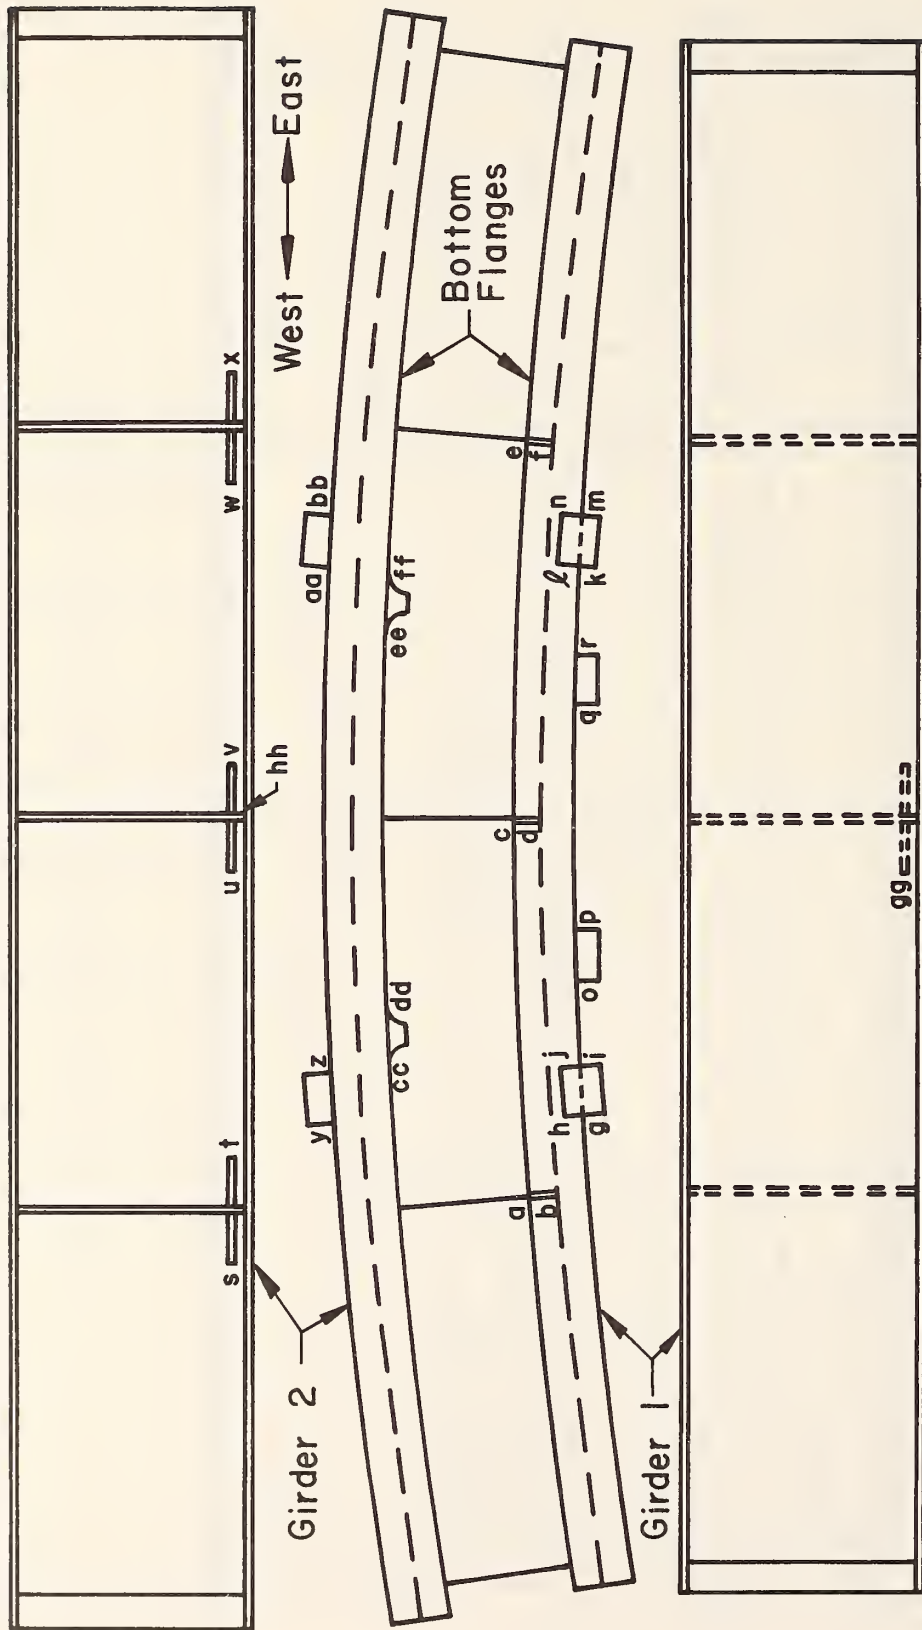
Group 1 and Group 2 Welded Details on Assembly 5
